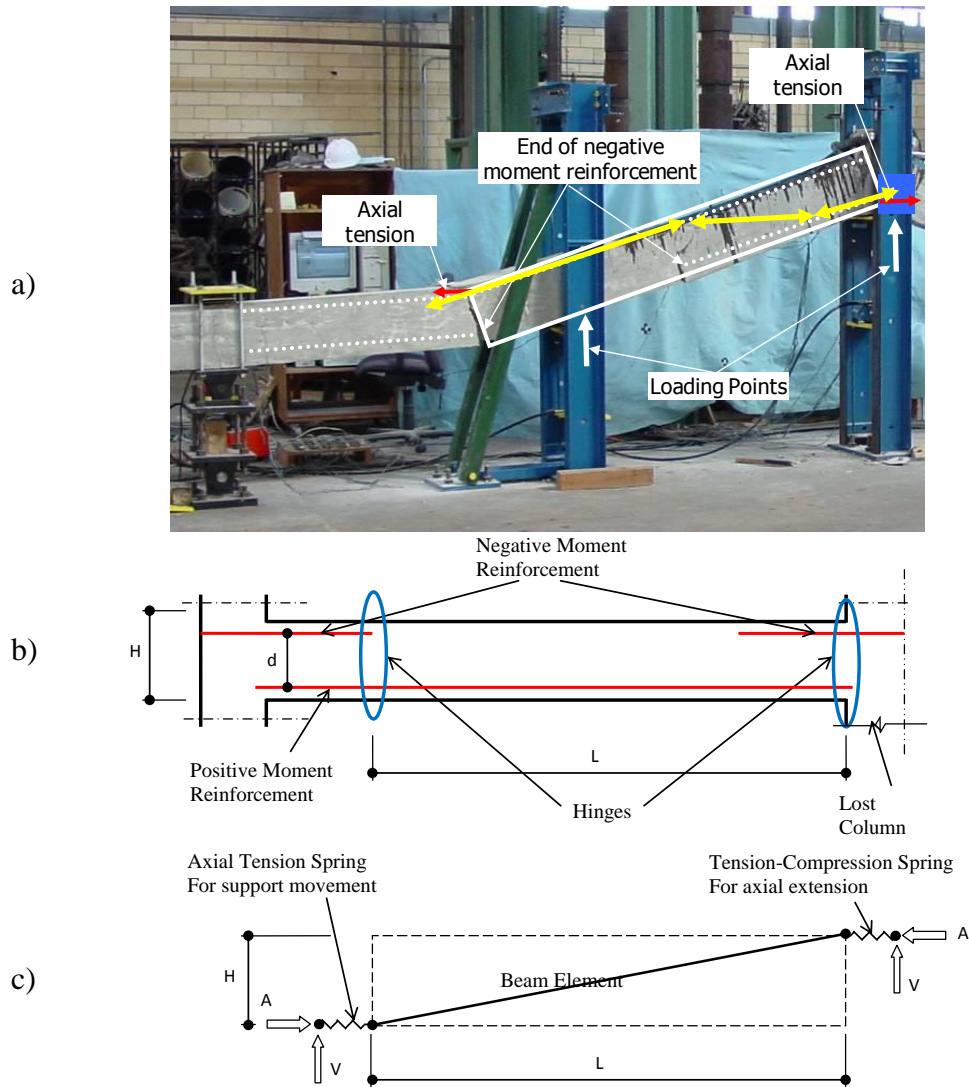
a. Reinforced concrete beam with non-continuous reinforcement Orton 2007).
